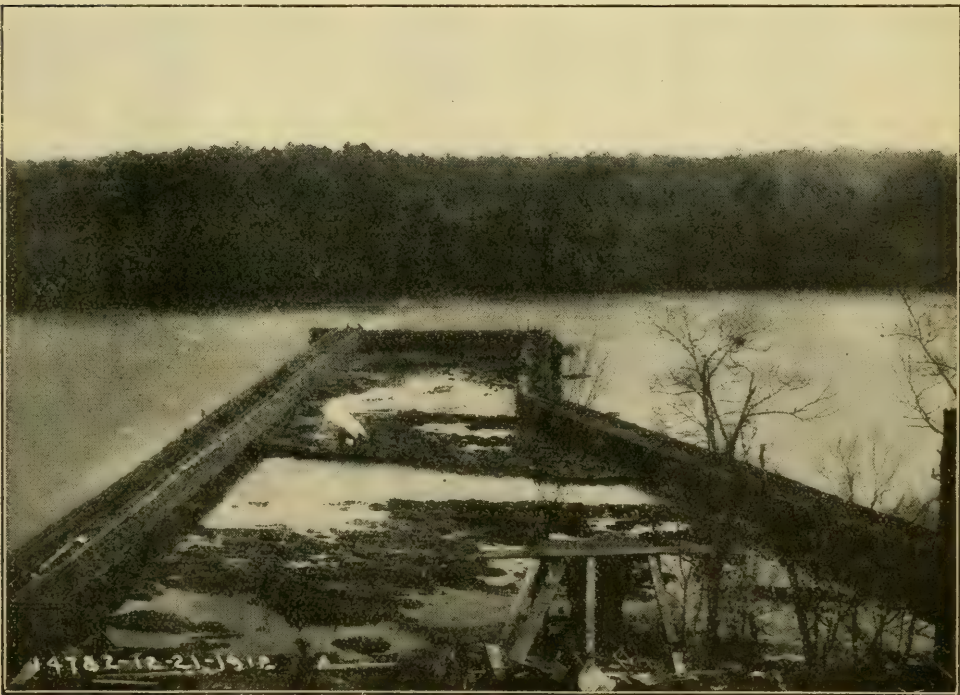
COFFER-DAM NO. 1 COMPLETED. DRILLING OF FOUNDATION STARTED.
